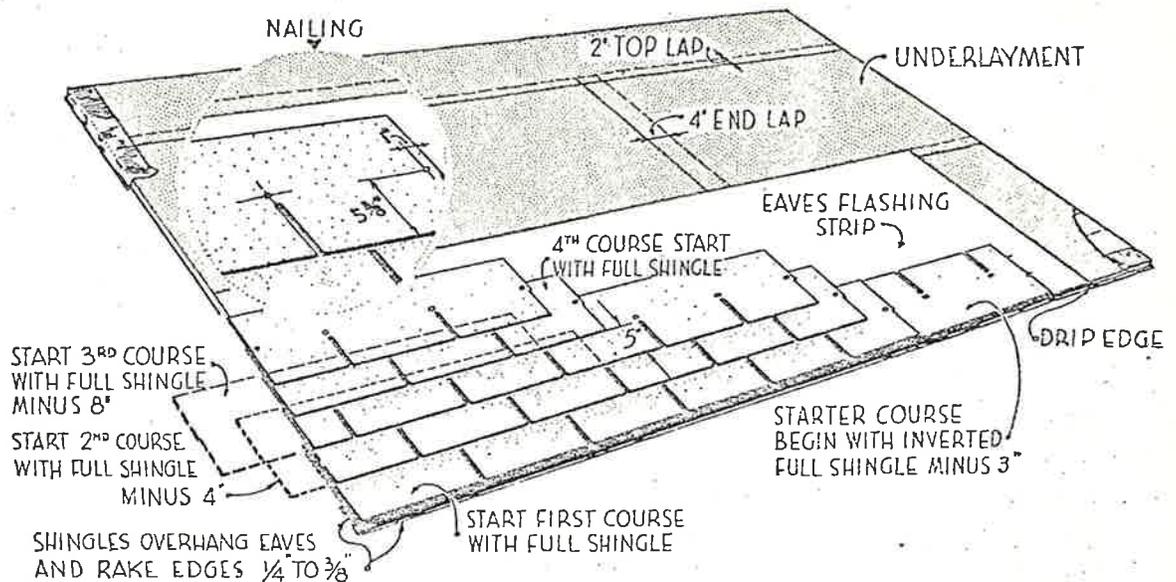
Three-tab square butt strips. Cutouts break joints on thirds.
